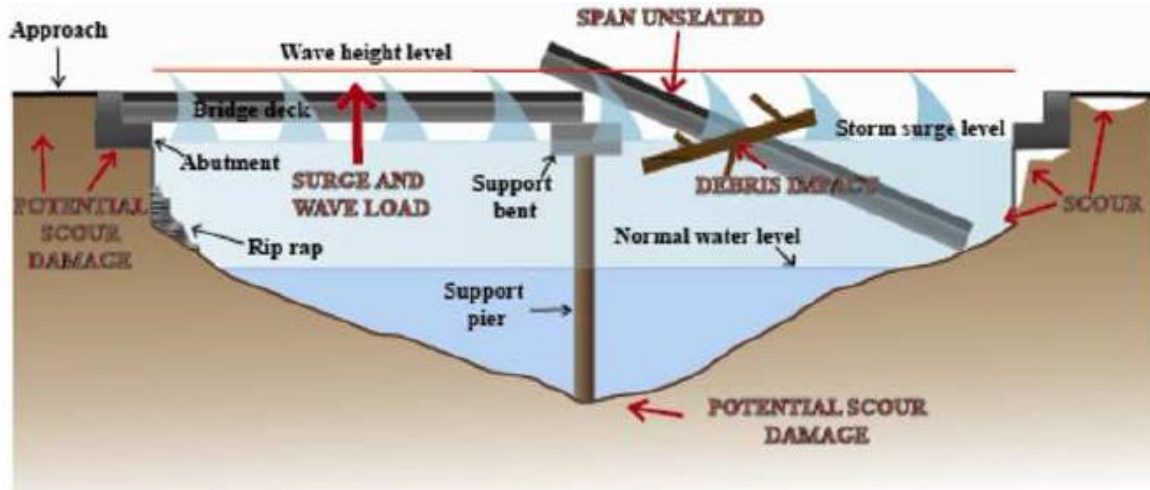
Illustration of common failure modes in bridge damage during hurricane event (Source Stearns and Padgett, 2011)
